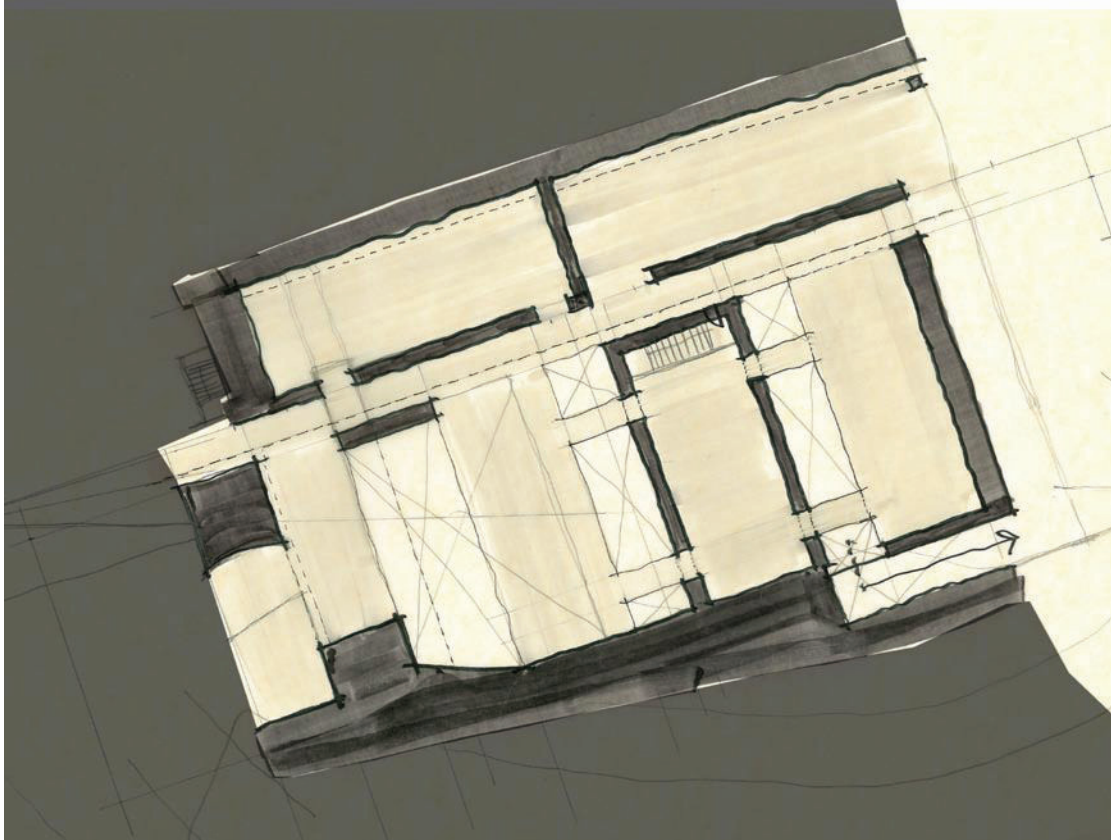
Plan view speculative design 3. [Drawing by Emily Childs]
